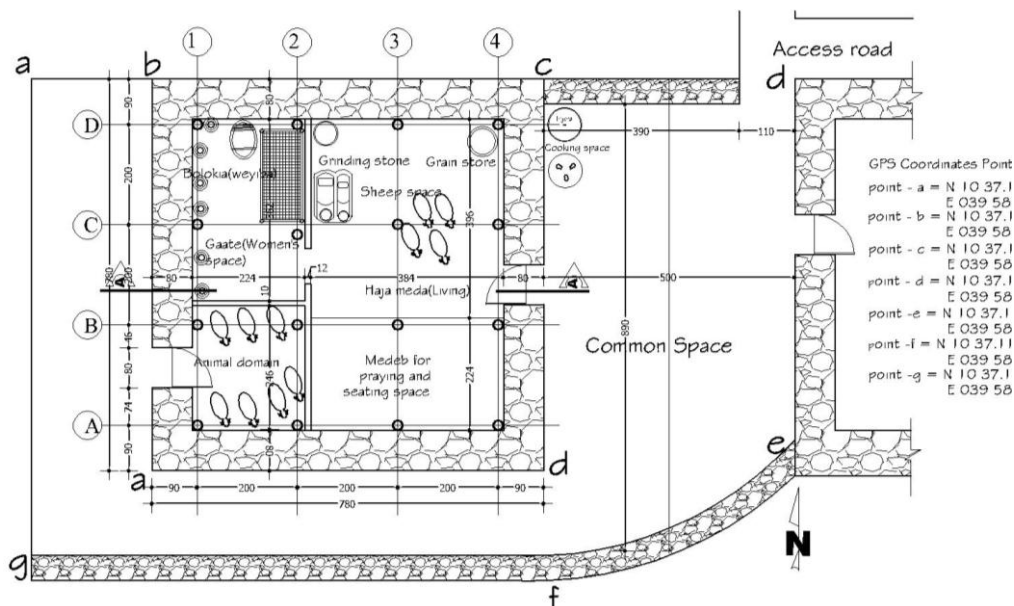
225 Compound and floor plan of W/ro Merema Beshir house.
